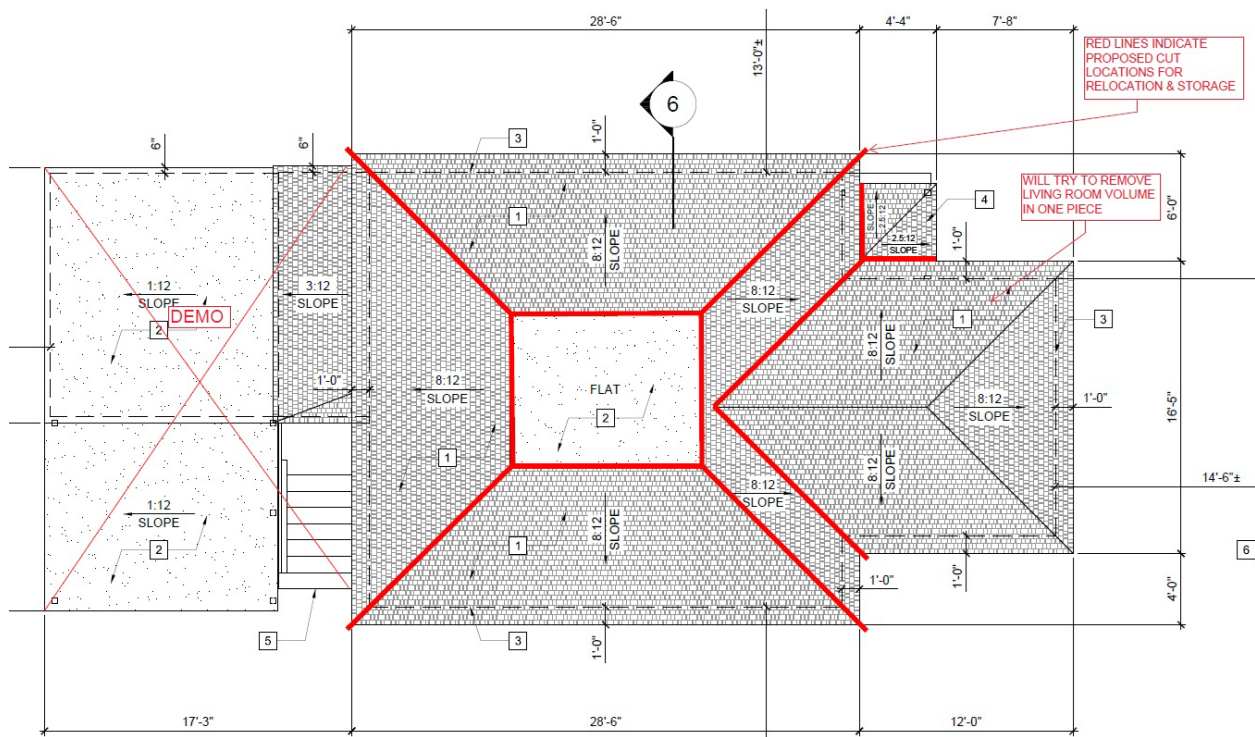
Roof plan showing the proposed cuts to dismantle the house for relocation.
